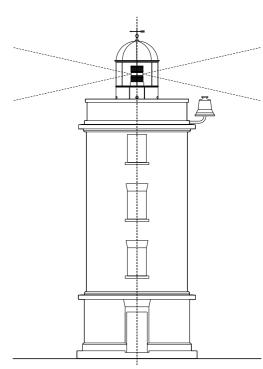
Elevation/ Plan of the Pier Head/Alexandra Lighthouse
